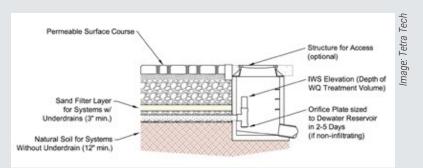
Permeable interlocking concrete pavement cross-section.
